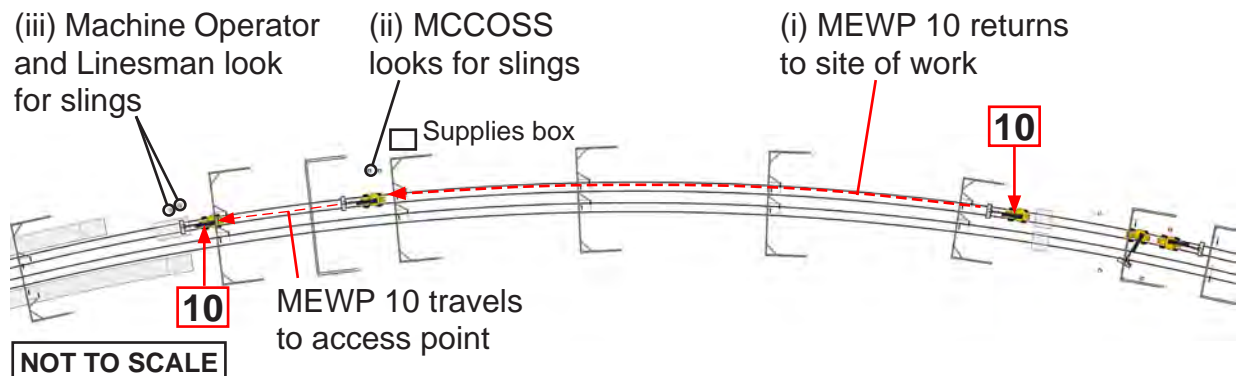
Route of MEWP 10 back to its original site of work and onward travel to the access point
